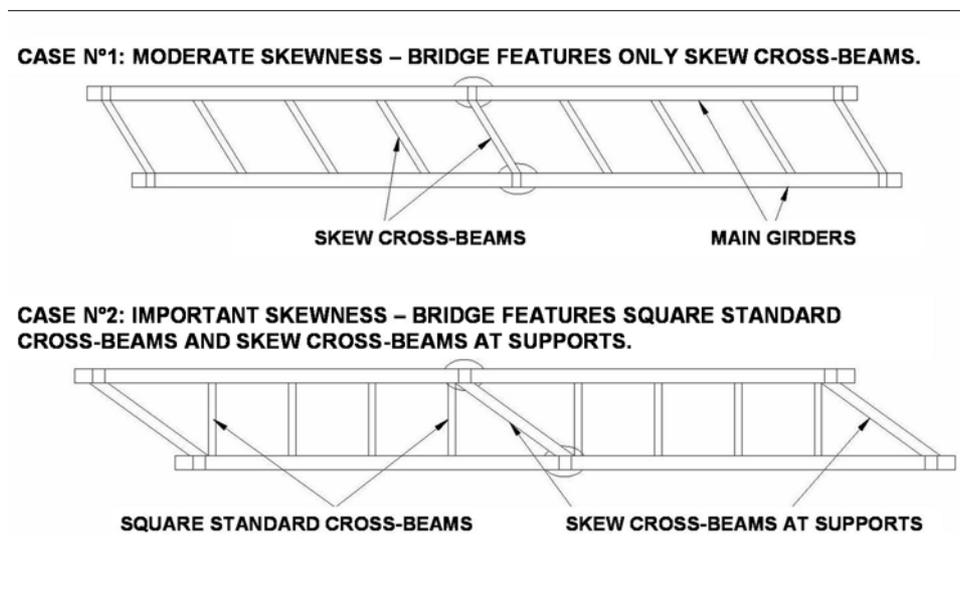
Cross-beam arrangement principle for twin girder skew decks
